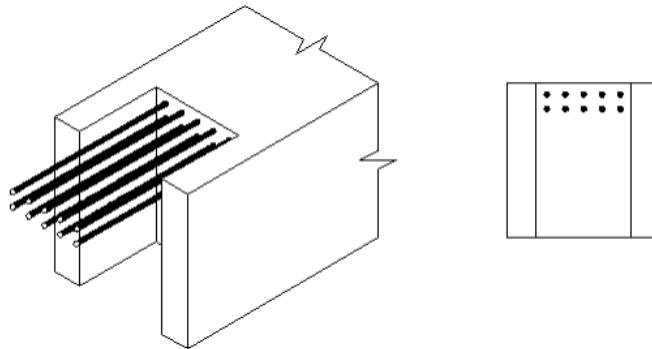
Spliced Reinforcement Connection*. (Unlu, 2010)
